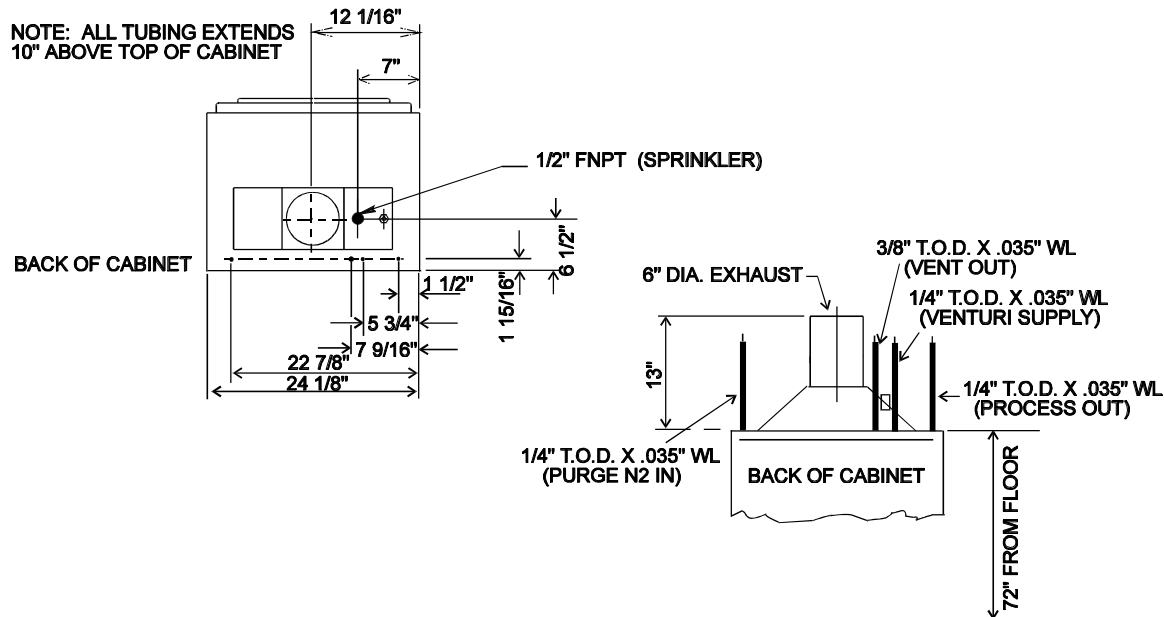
Typical 2 Cylinder Installation Connection Points
